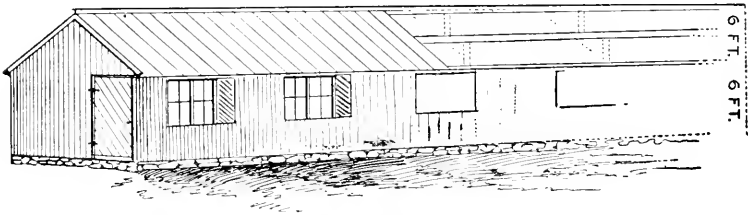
Showing how boards, roofing and windows are placed, with ventilating slides beside each window.
